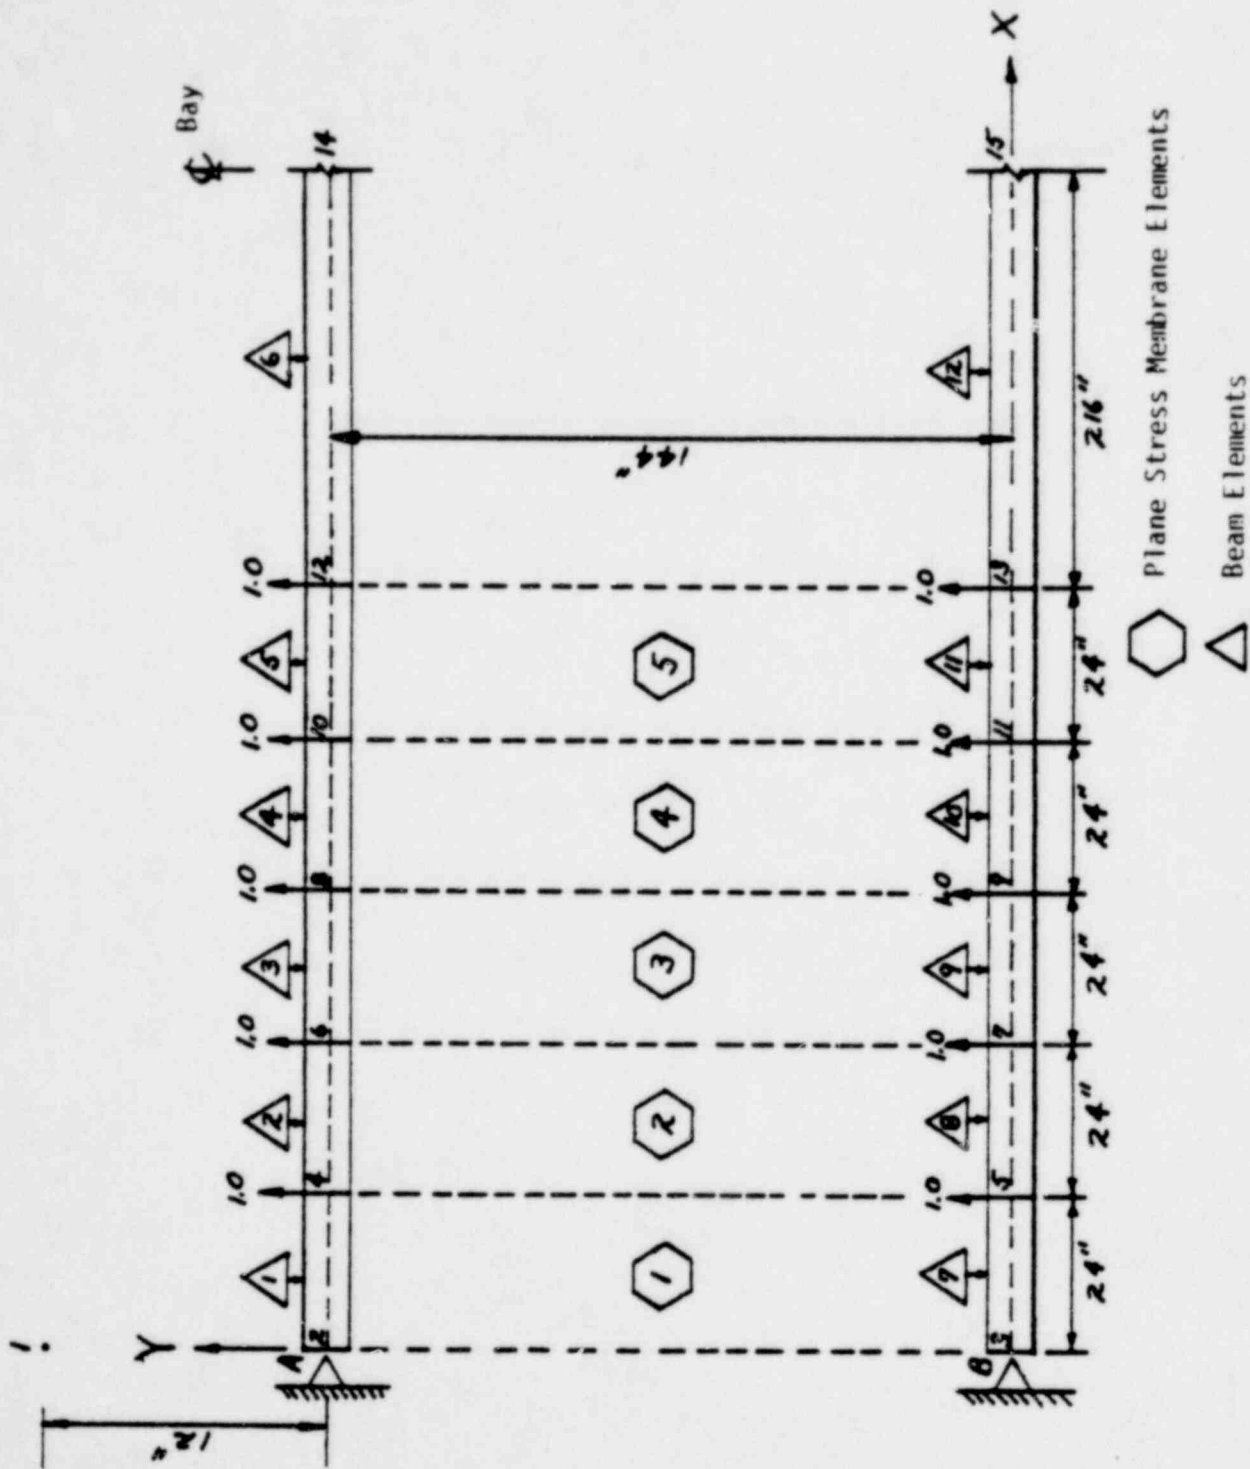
FINITE ELEMENT MODEL OF TYPICAL ROOF SECTION
